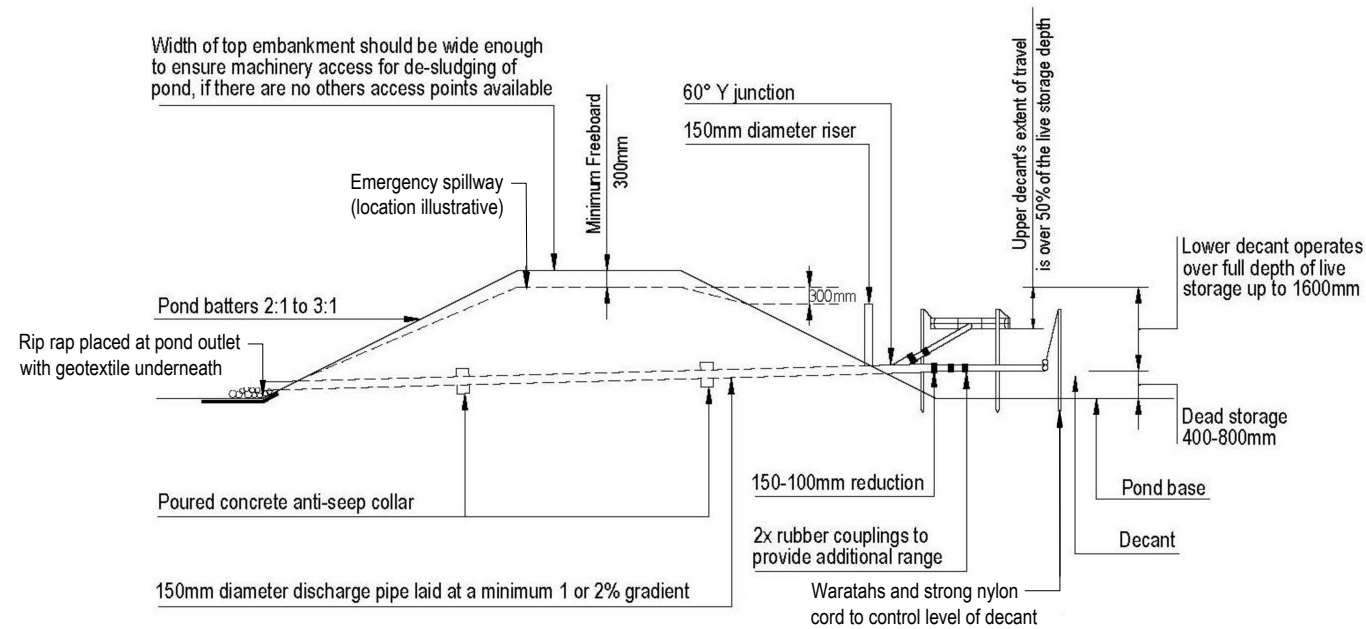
CROSS-SECTION OF OUTLET FOR 1.5-3ha CATCHMENT
